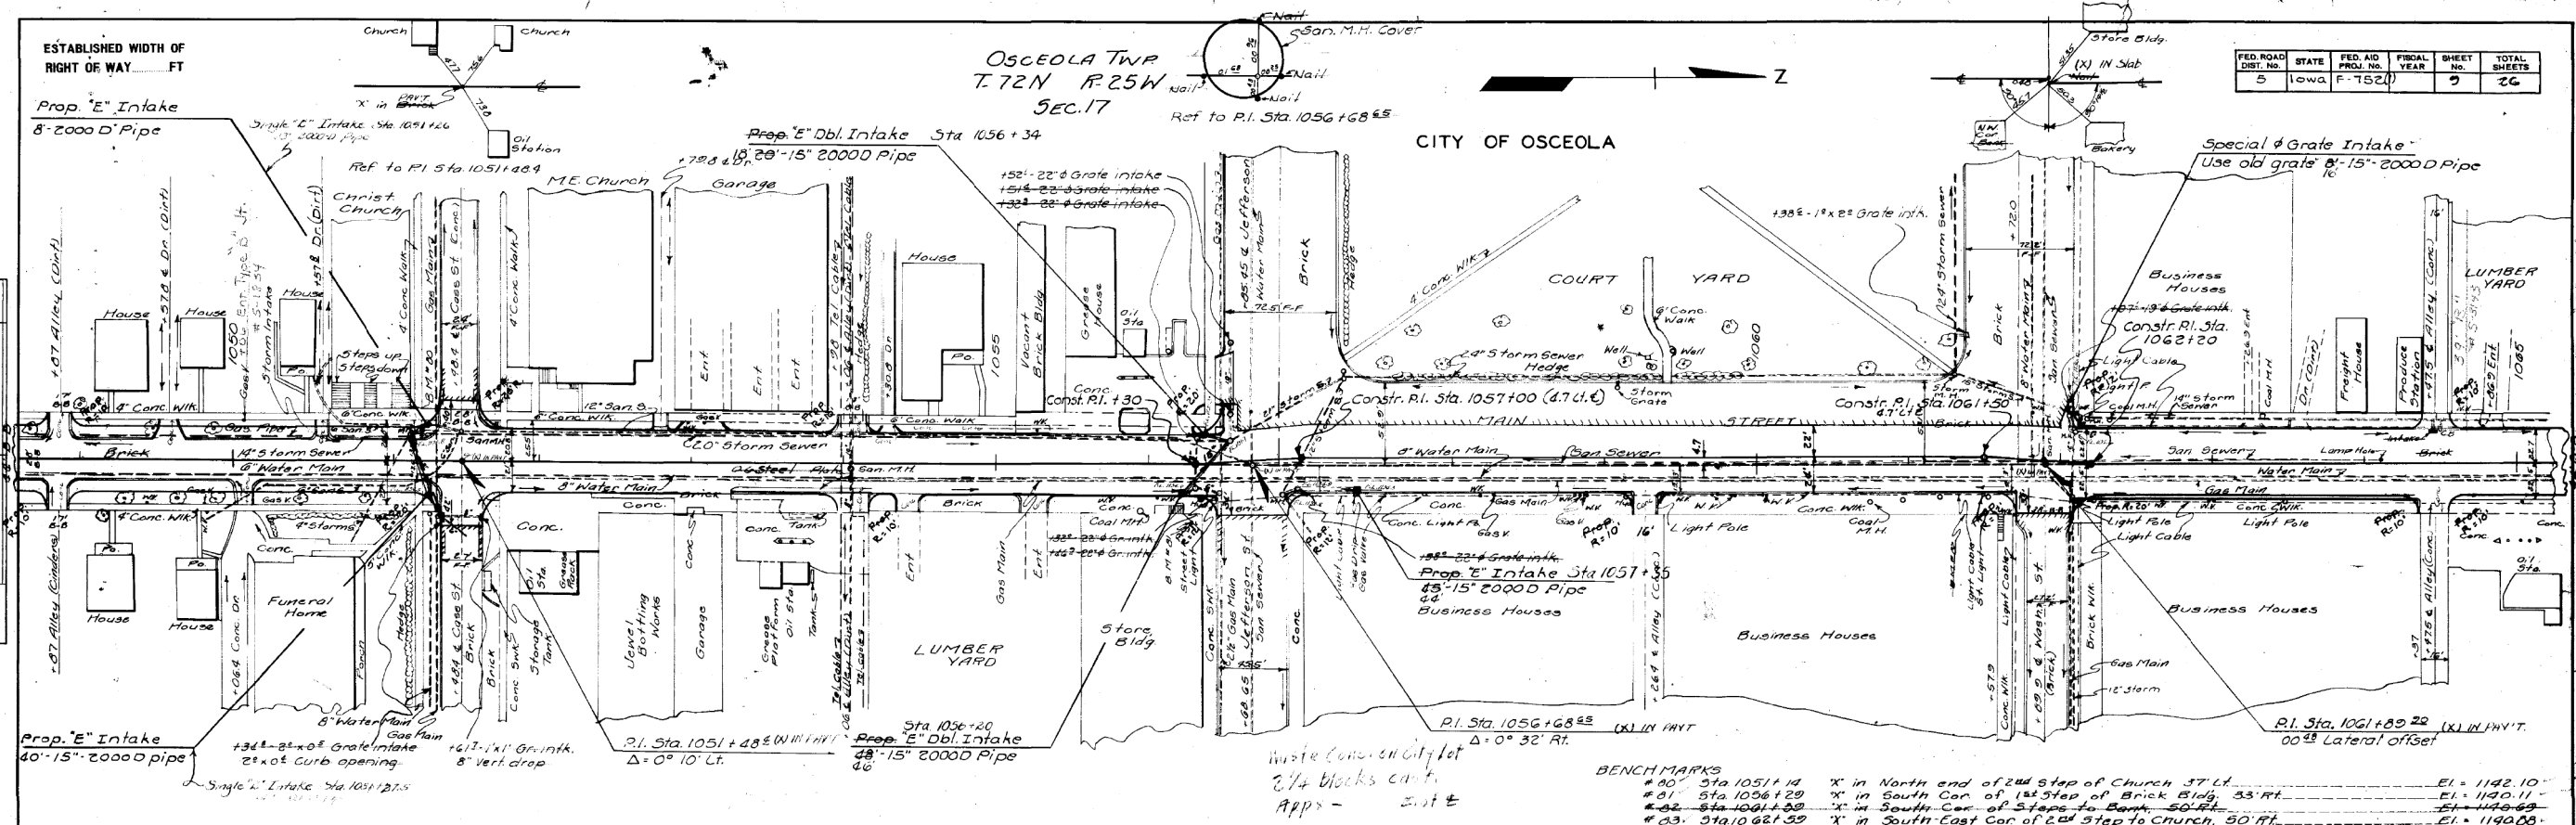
PLAN-PROFILE OF P.A.R.A.K.E. STANDARD
